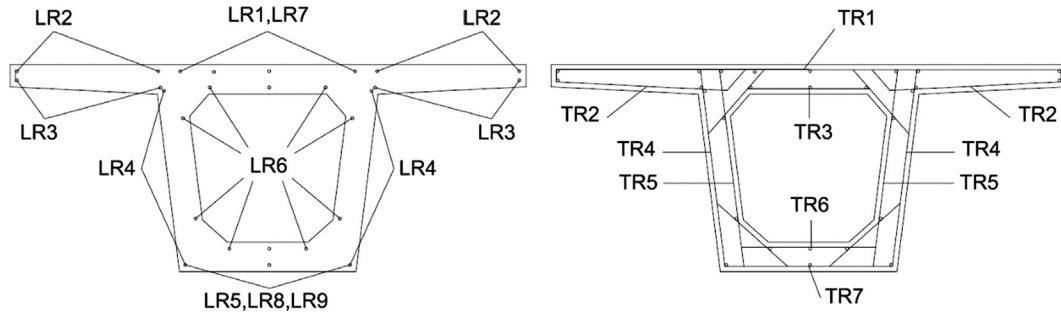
Longitudinal and transversal reinforcing steel disposition.
